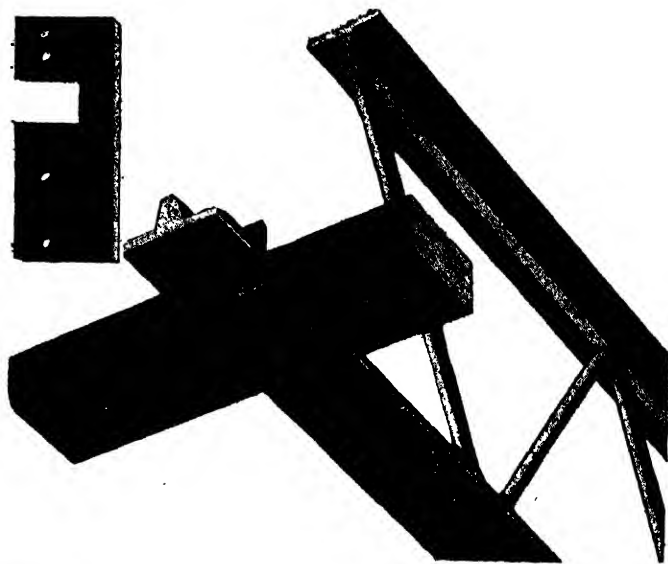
,684.—Showing furring clip for attaching wood screed to bottom chord of steel joist. Where wood screeds at right angles to the steel joists are required on the underside of the steel joists for ceiling construction, they can be attached by means of special furring clips as shown. These furring clips are made reversible to care for different thicknesses of wood screeds. Two clips are required at each intersection of screed and joist, and they should be attached on opposite sides of the screed as indicated.
